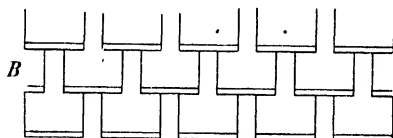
ELEVATION OF OPEN SLATING ROOF
